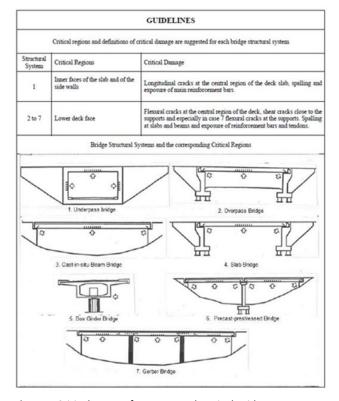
Critical Areas of Damage and Typical Bridge Forms
